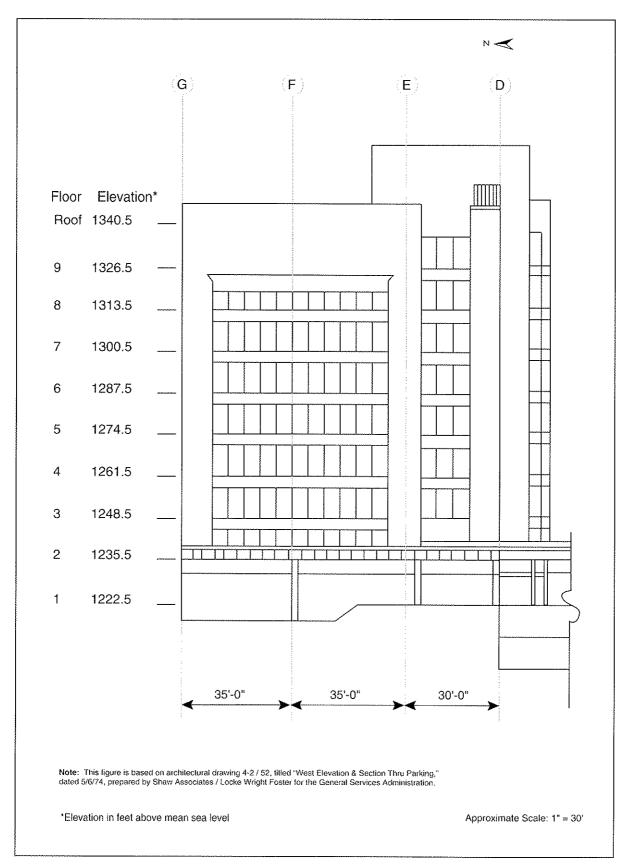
West elevation – nine-story portion of Murrah Building.
